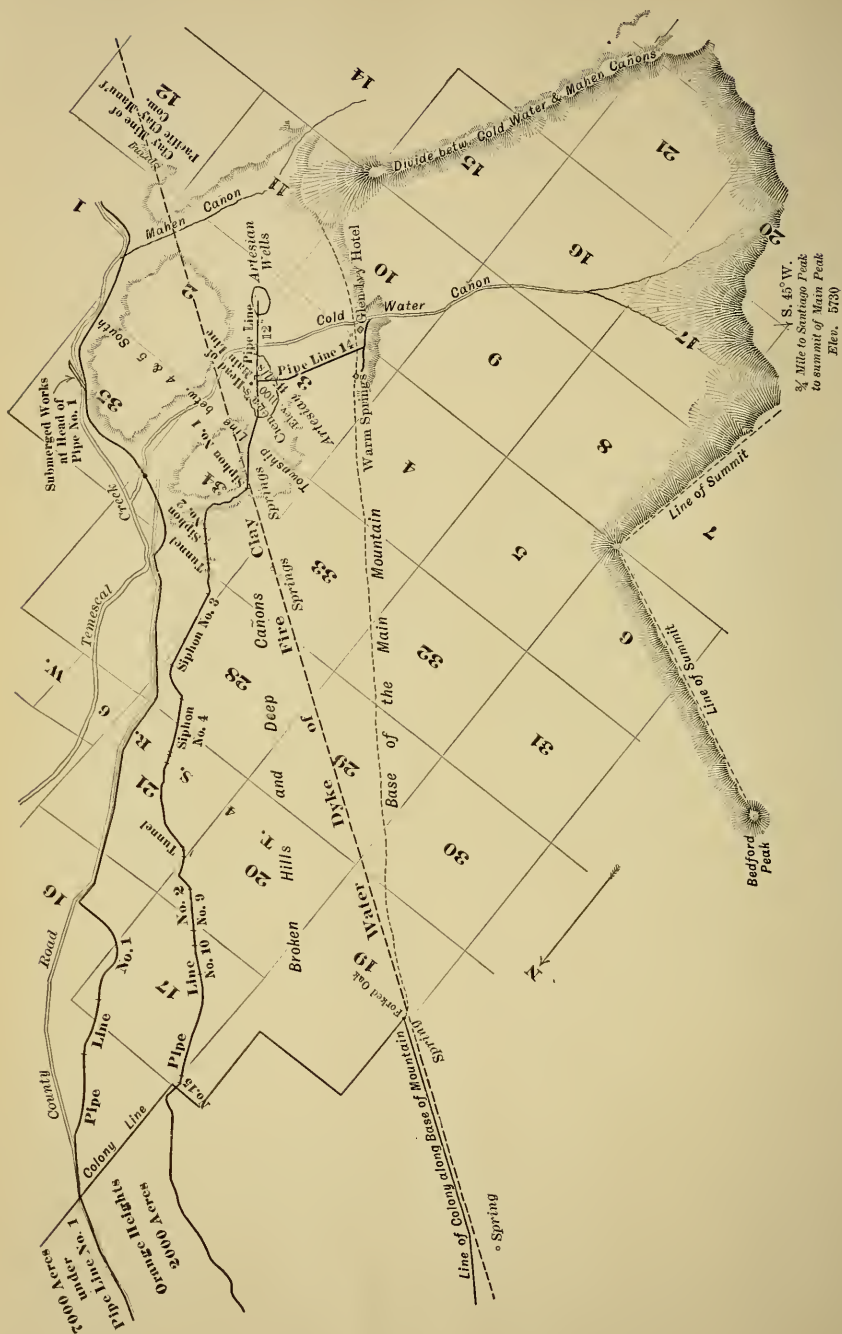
PLAN OF SOUTH RIVERSIDE COLONY.
